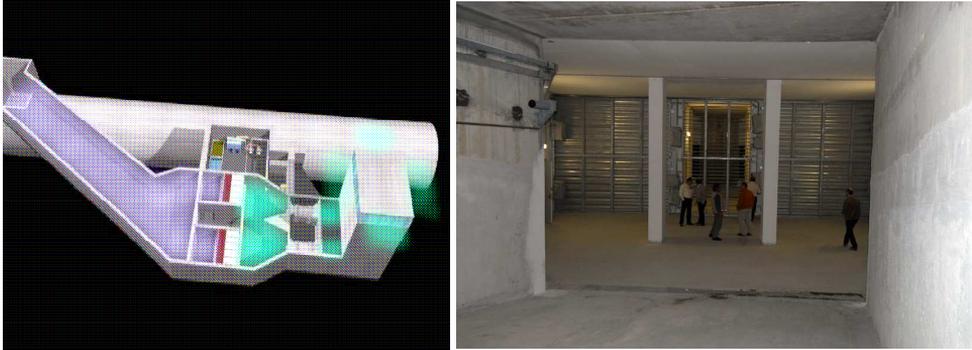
Exhaust extraction from a unidirectional tunnel (Aigner Tunnel Technology GmbH). The whole plant is shown on the left picture, with the road tunnel in the background, the extraction duct on the left, exhaust treatment and fans in the central part and the stack on the right. The right picture shows the filtration equipment on both sides and the bypass in the middle. The filtration equipments are not used in case of fire.
